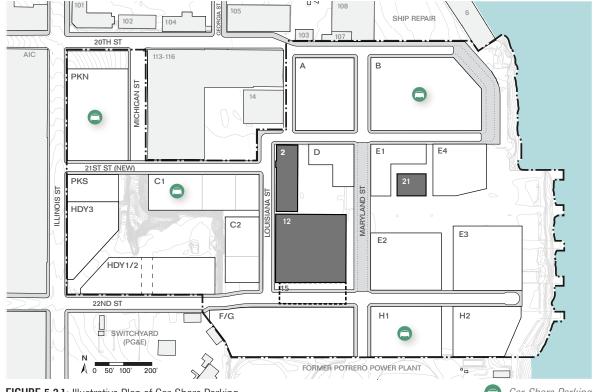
Illustrative Plan of Car-Share Parking
